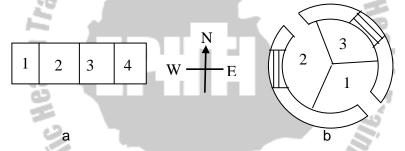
Ground plan of a House. (a) Rectangular houses (b) Circular houses
